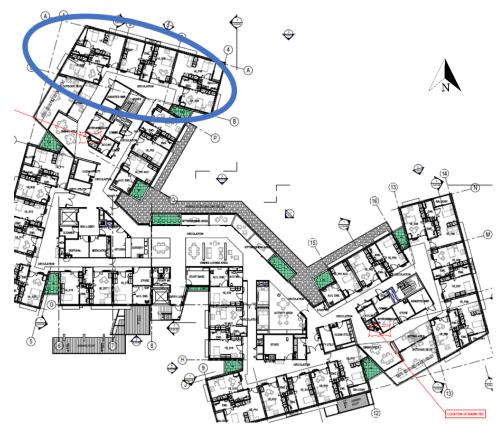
Typical RAC floor - levels 3-5, with 'living lab resident rooms' circled
